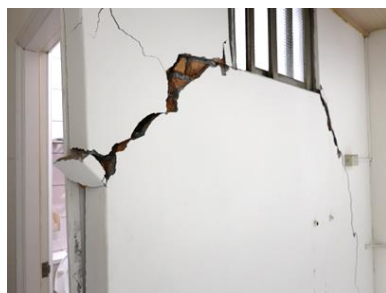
Large inclined cracks in masonry walls of Building C05.
